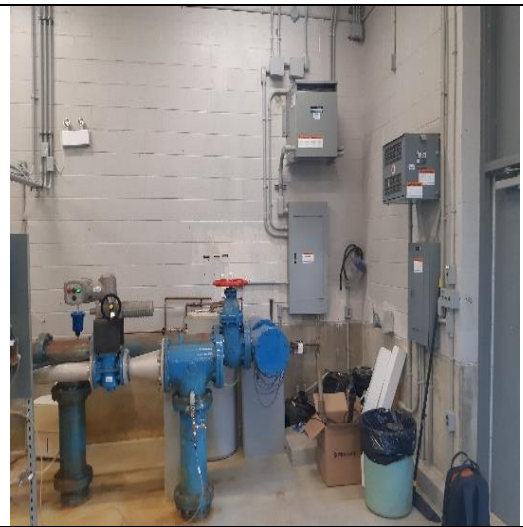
ELECTRICAL PANEL HOUSED INSIDE THE MILL ST PUMPHOUSE (SOUTH)
